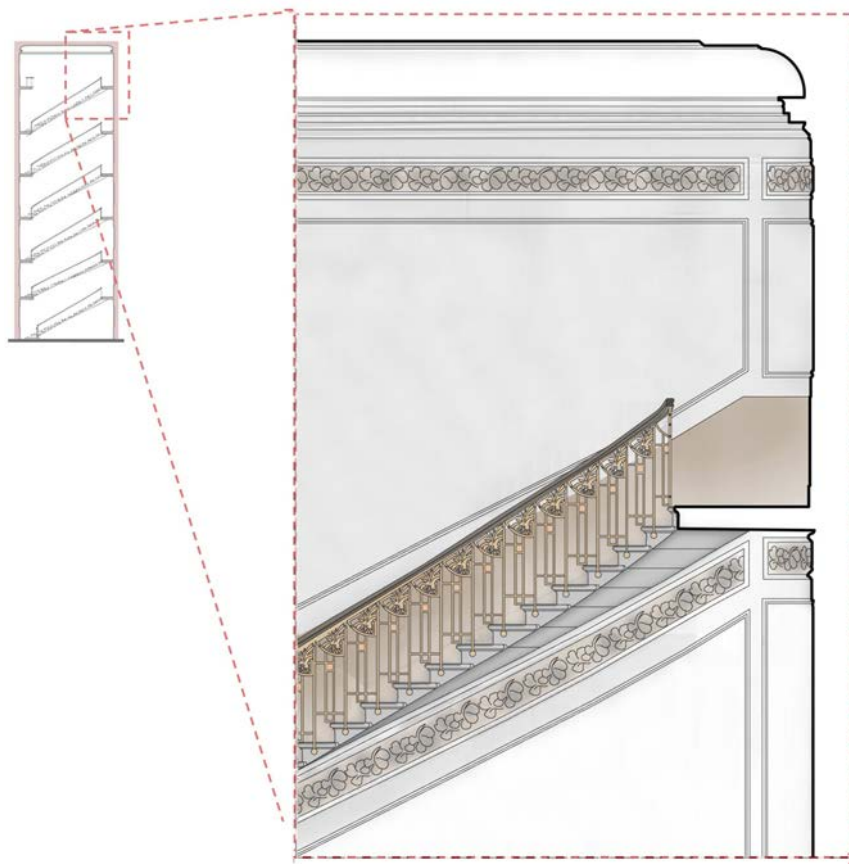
Helicoidal staircase of Palazzo Mannajuolo. Detail of the longitudinal section.
